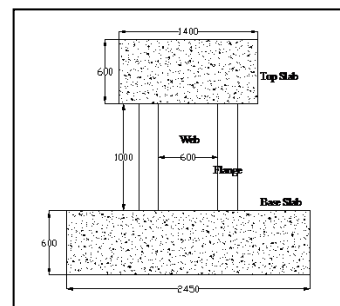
Dimensions of shear wall (aspect ratio 1.0). All dimensions are in mm
